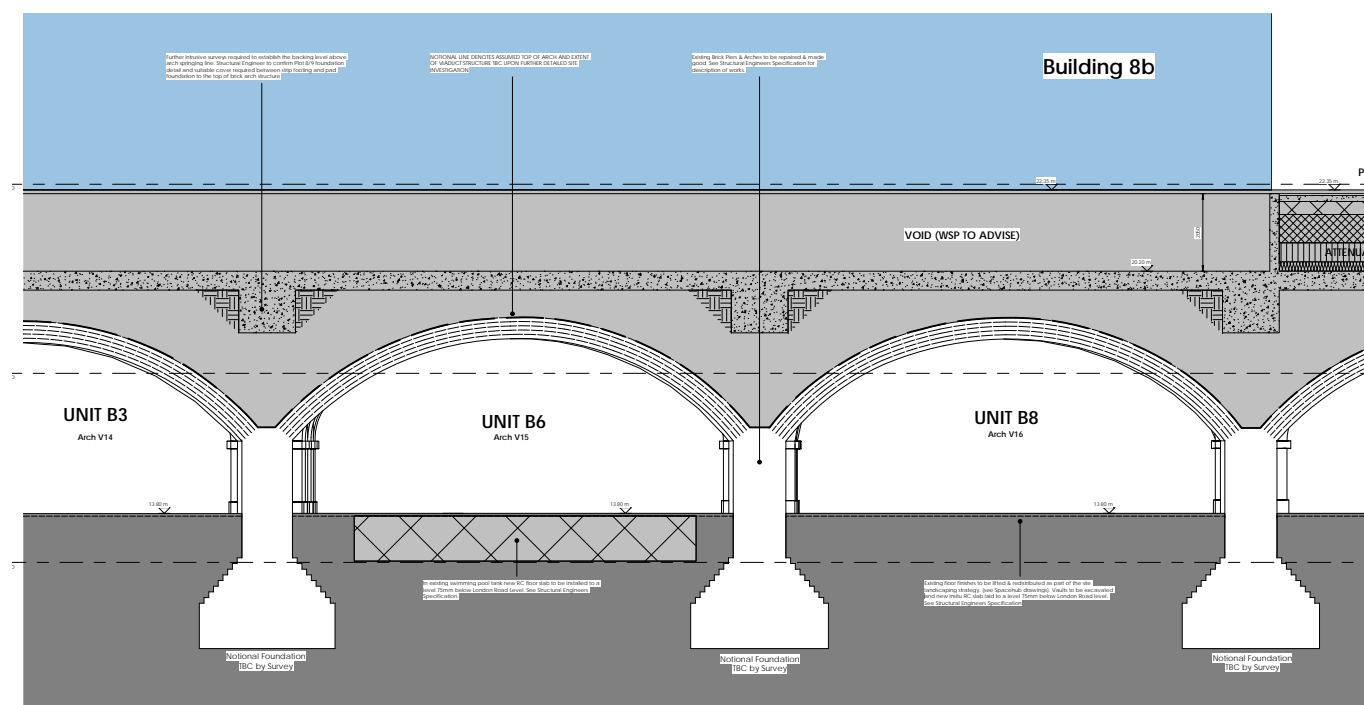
Example of detailed drawing section through Braithwaite Arches
